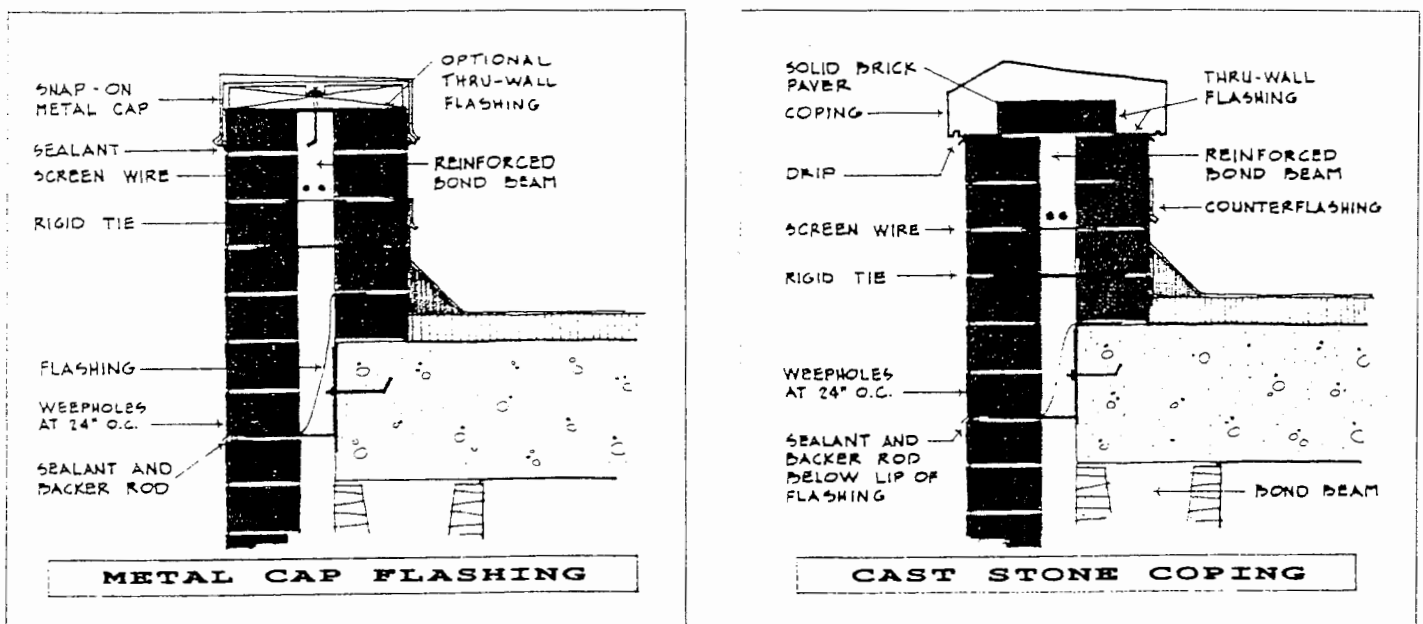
A major water entry point, the parapet should be capped with a stone, cast stone, terra-cotta, or metal coping, but not brick. Install through-wall flashing in the bed joint immediately below the coping.
